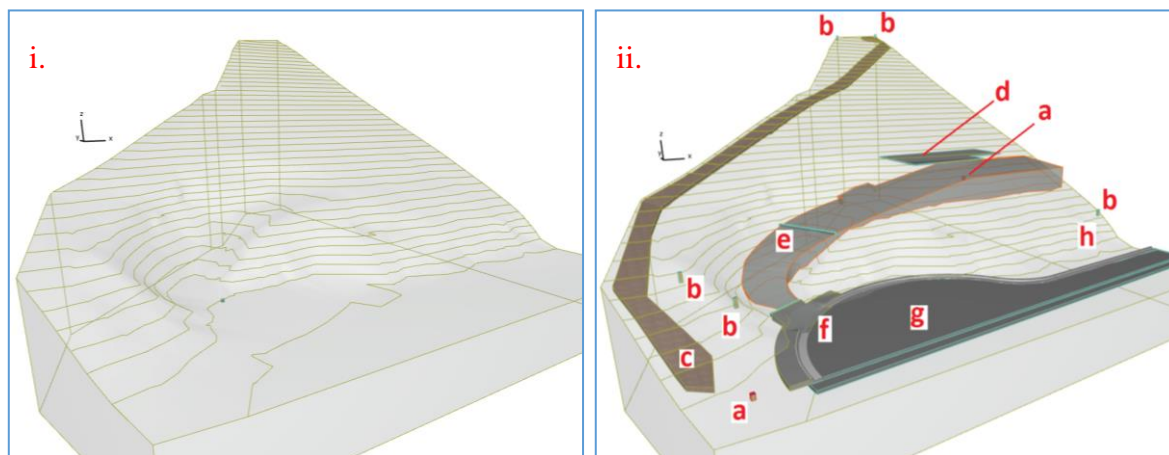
i.) The 3D model of the terrain ii.) The BIM model of the future building site a.- TBMs b.- 'temporary boundary pegs c.- unsealed track d.- the floor (concrete slab) of the future garage e.- the proposed driveway with st/w drainage grates f.- existing crossover g.- existing cul-de-sac (Created by: F. Acs)
